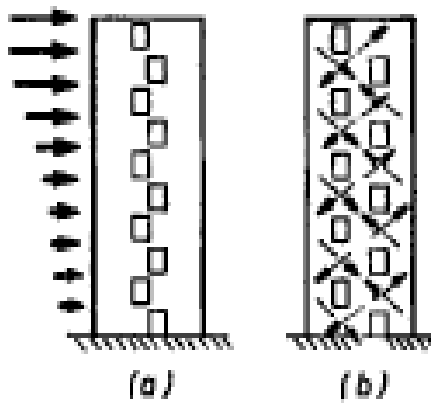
Shear strength of wall as affected by openings (source: Paulay and Priestley, 1992)
